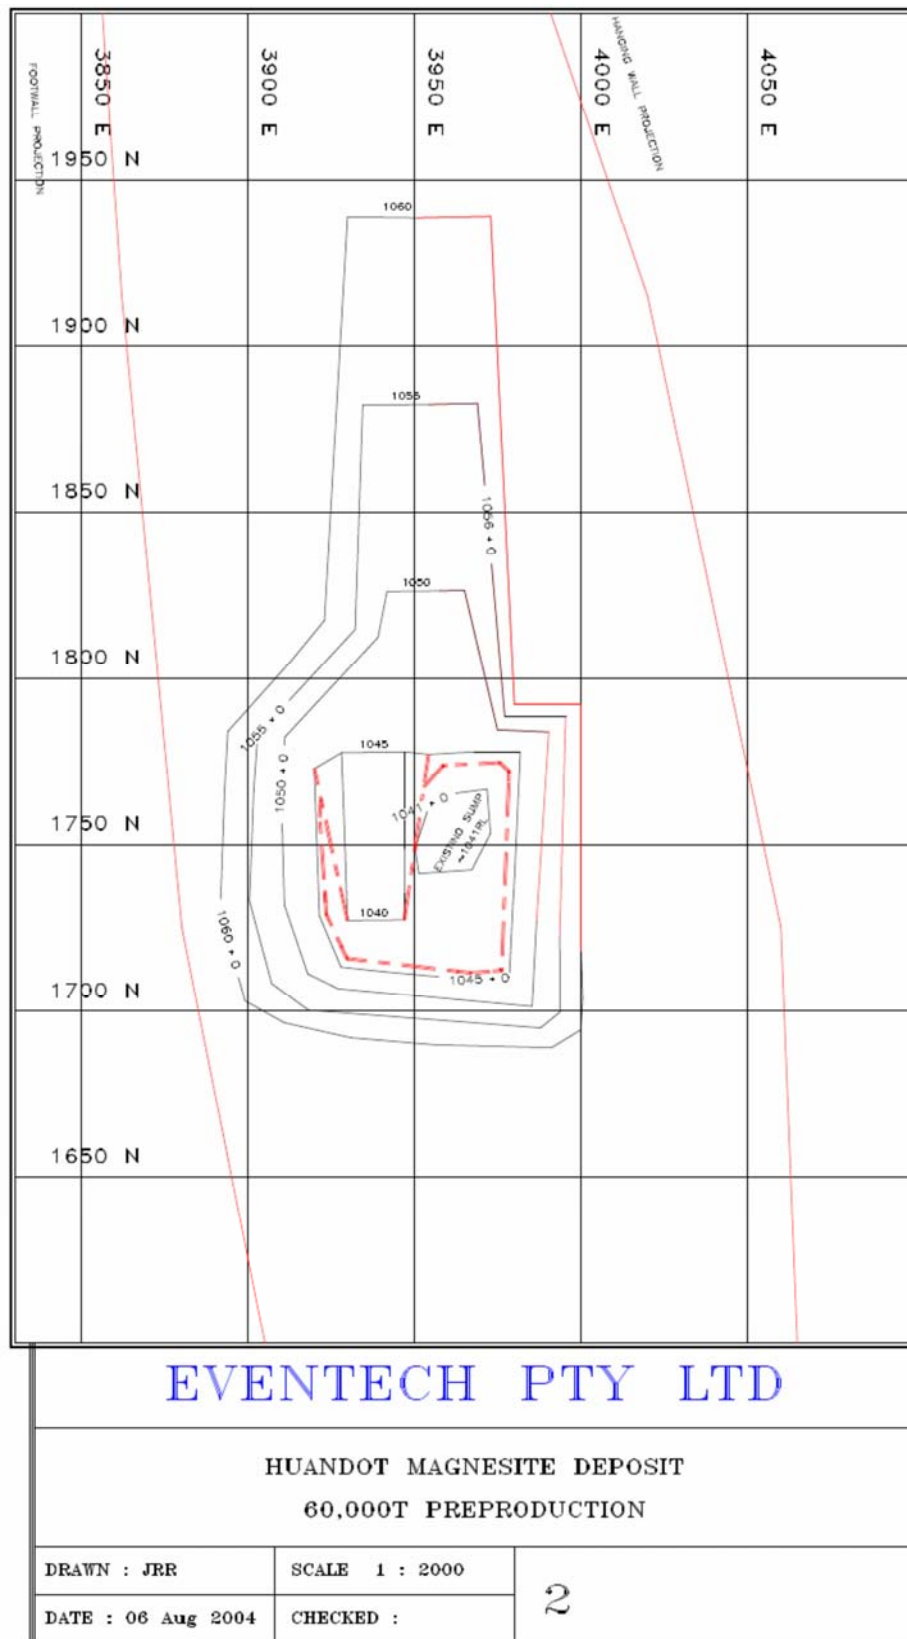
Proposed preproduction pit development between footwall & hanging wall
